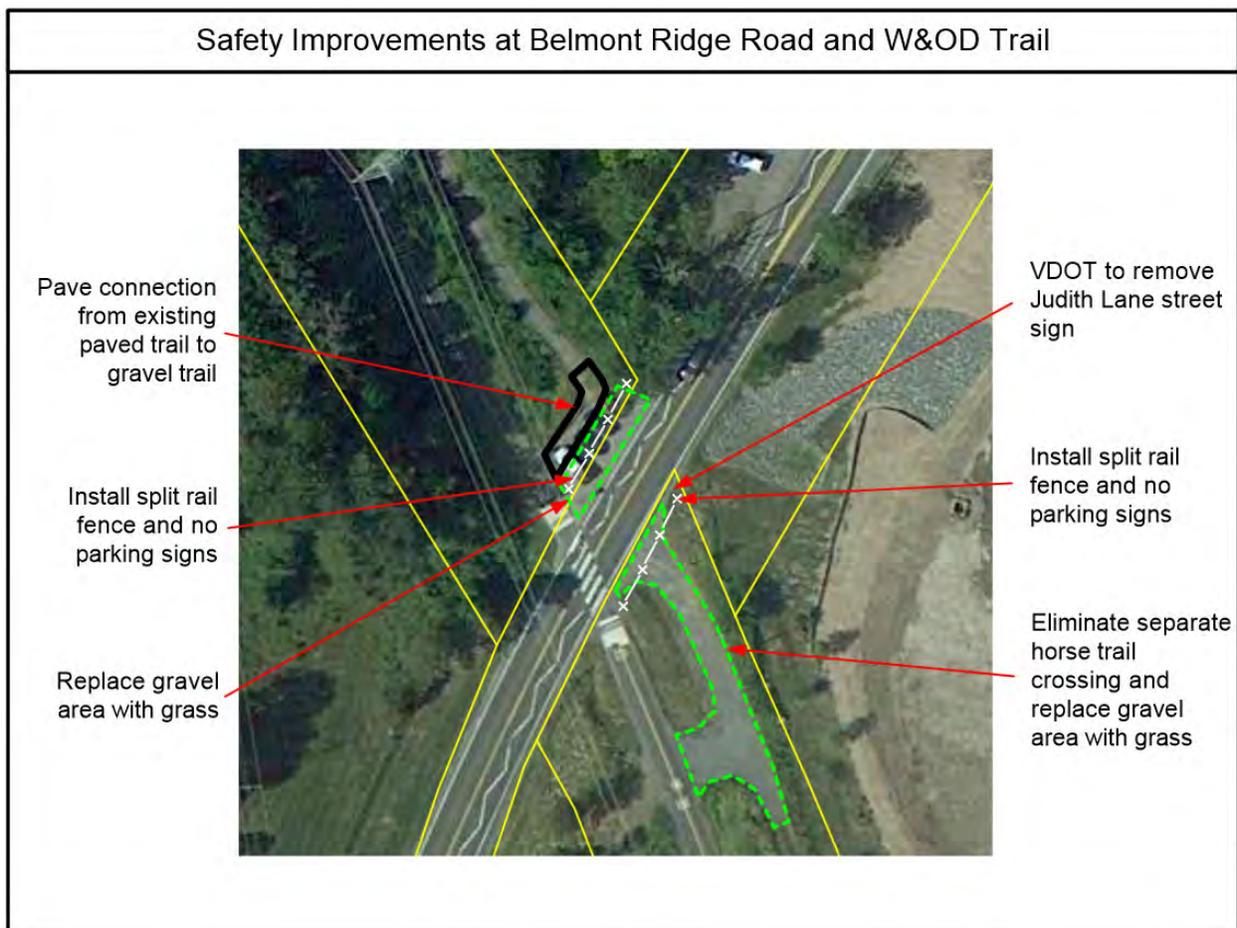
Aerial View of Site Improvements Made to Intersection of W&OD Trail and Belmont Ridge Road
